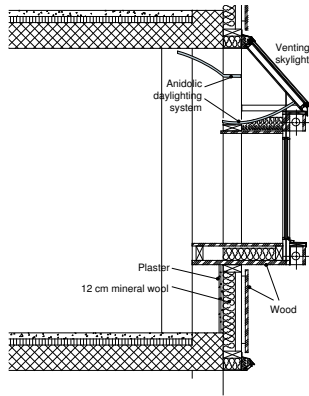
Vertical section through the southern facade, showing the anidolic system
